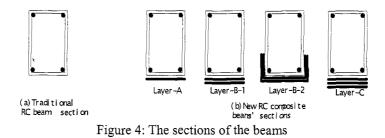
shows the traditional RC beam section and the corresponding new RC composite beam sections. The anti-crack layer thicknesses in the new RC composite beams are respectively 0.6, 1.2, 1.2, and 1.6mm. The GFRP layers were manually bonded on the bottom face of the beams 30days after the concrete was cast.
